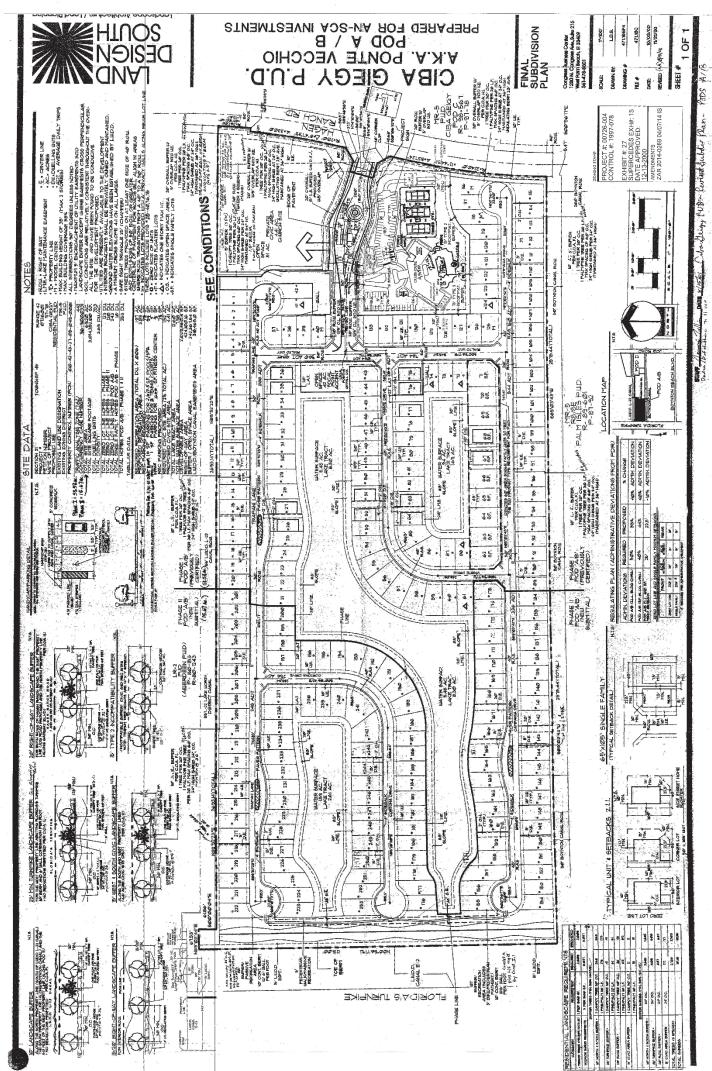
Approved Subdivision Plan Pods A and B, dated December 13, 2000
